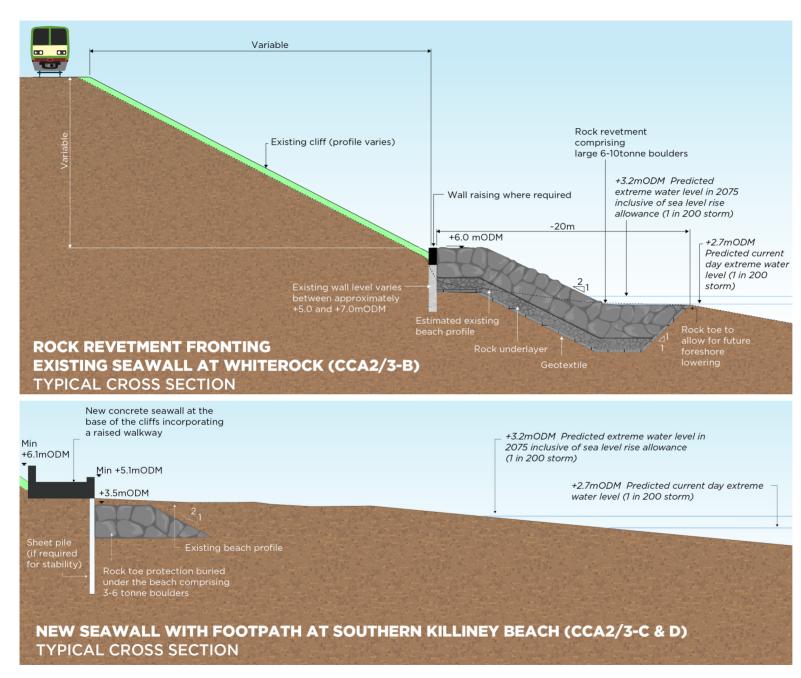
CCA2/3 Typical cross sections showing rock revetment fronting existing wall and cliff (top) and rock revetment fronting existing path and cliff (bottom)
